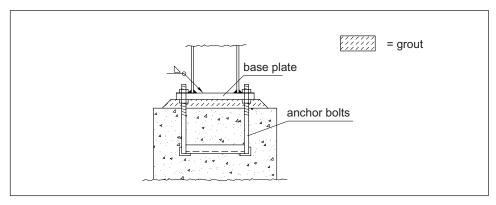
Column-to-foundation joint using anchor bolts [20]
